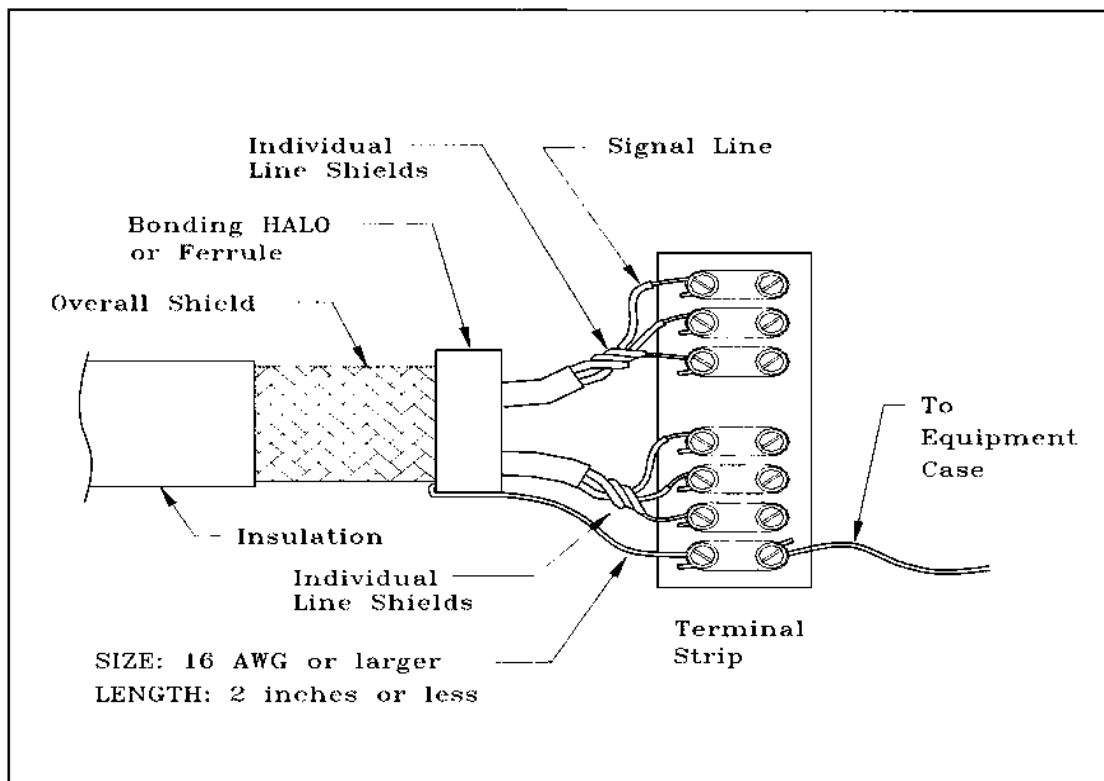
Figure IV. Grounding of Overall Cable Shield to Terminal Strip
